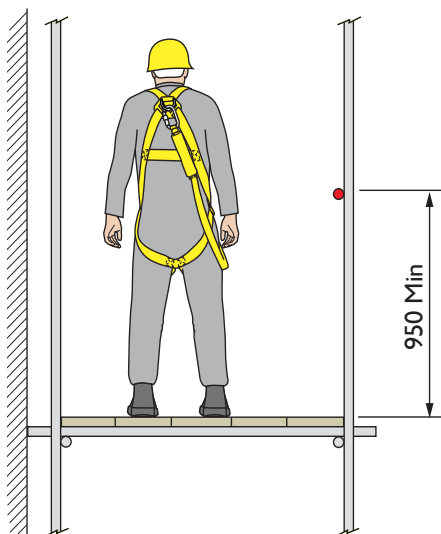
A cross-section of temporary scaffolding working platform to form the minimum scaffolders' safe zone.
